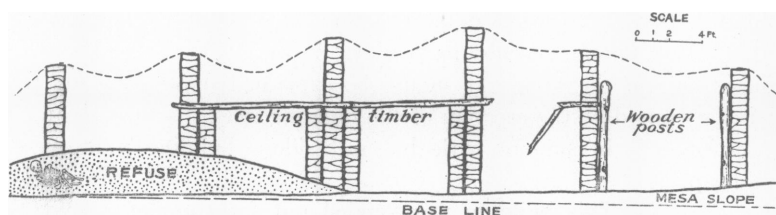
Slightly generalized Cross-section about Midway on Building X, San Cristobal, showing the Relation of the Building to a Refuse Heap, also the Height of the Ceiling and how it was Supported by Additional Walls, Posts, etc.
